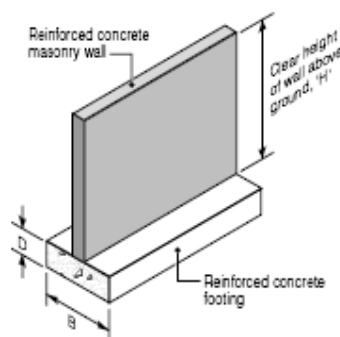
Reinforced Concrete Masonry Wall on Reinforced Concrete Strip Footings
